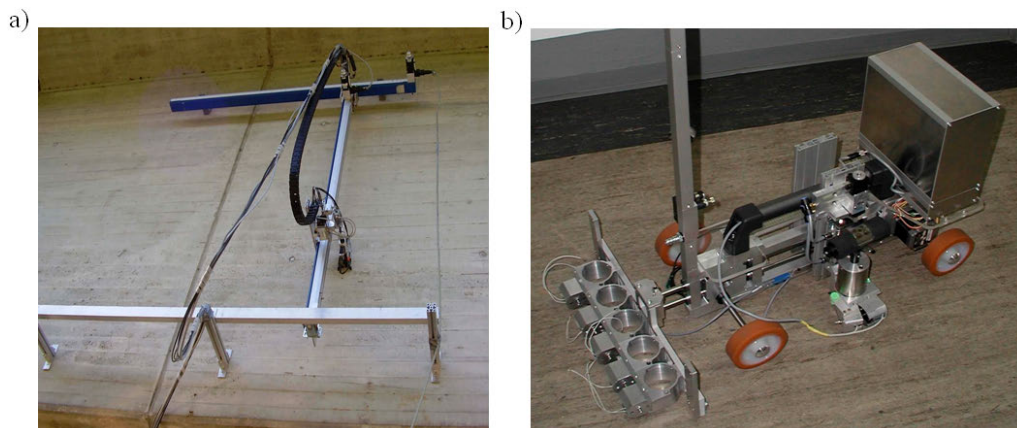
Examples of: a) scanner for testing vertical surfaces of concrete bridge girders, b) robot for non-destructive testing of large flat concrete elements [25]
